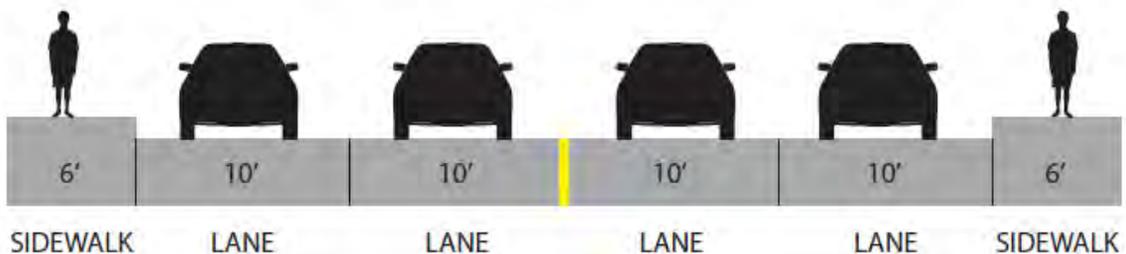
Center Boulevard East of the Fairfax Post Office – Cross Section
